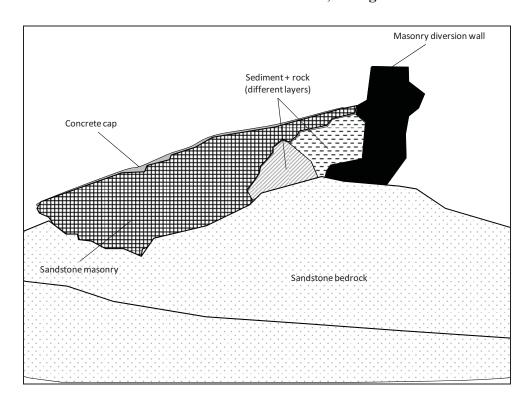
Schematic cross-section of southern portion of diversion wall and concrete-capped sandstone, with stratigraphy.
